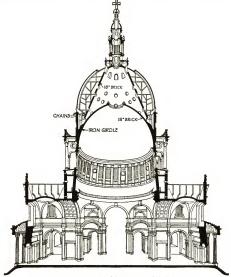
St Paul's Cathedral, London: section of Wren's dome.
